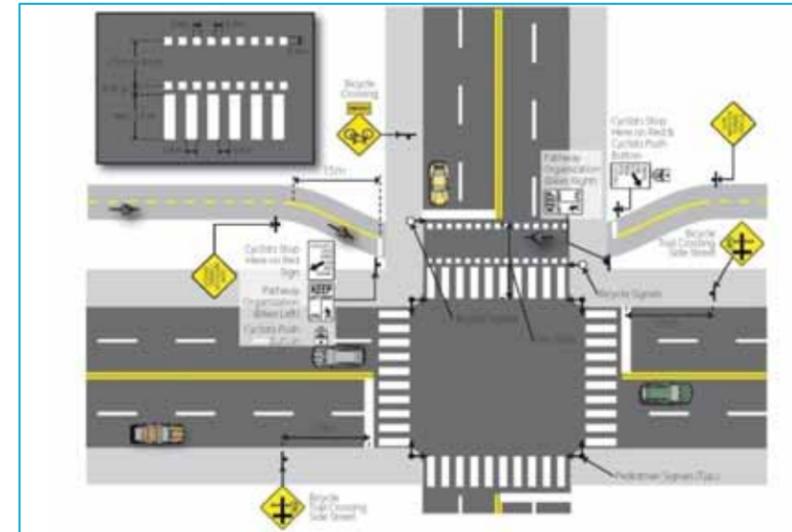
Bikeway Path Crossing Road at Signalized Intersection
